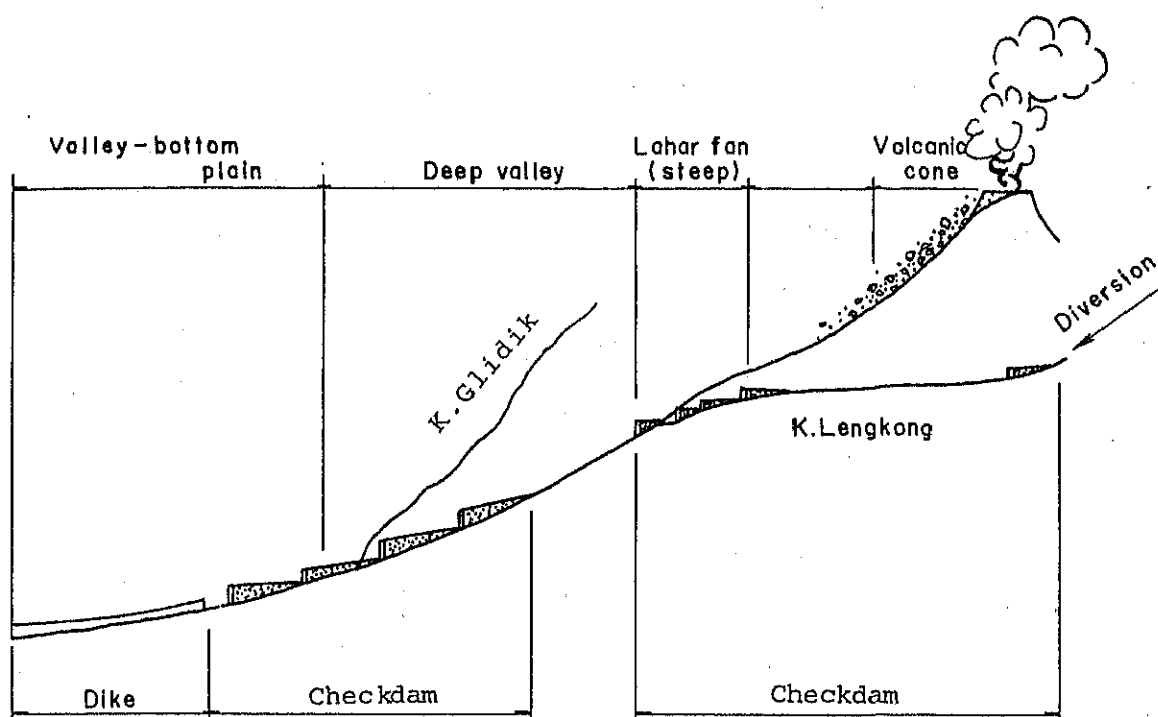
Schematic Drawing of Sediment Control Facilities Plan in K. Glidik
